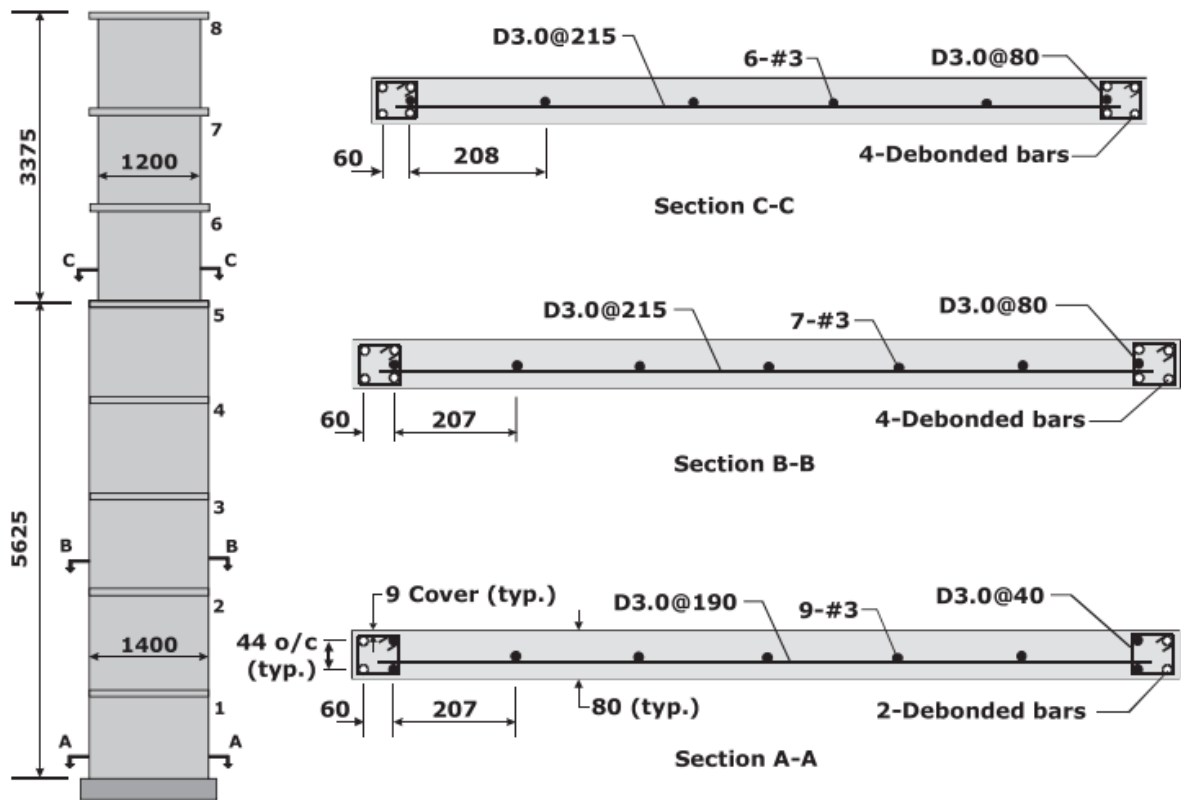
Model wall dimensions and steel reinforcement (dimensions are in mm)
